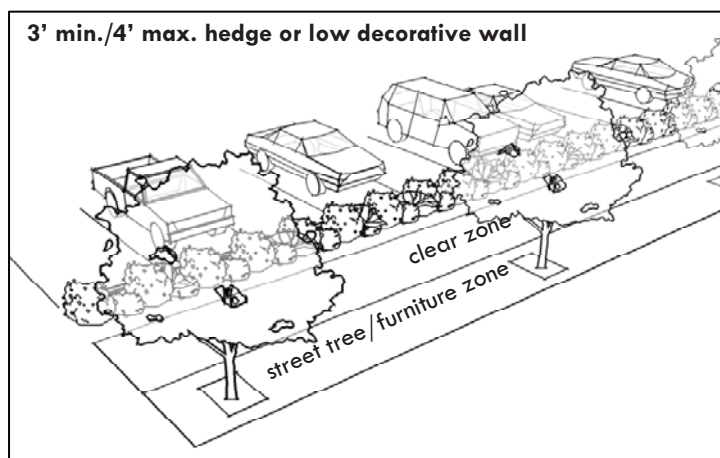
No parking is allowed between the street and the building façade and when parking is located to the side of a building, screening is required between the parking and the sidewalk (TOD CTC example).
